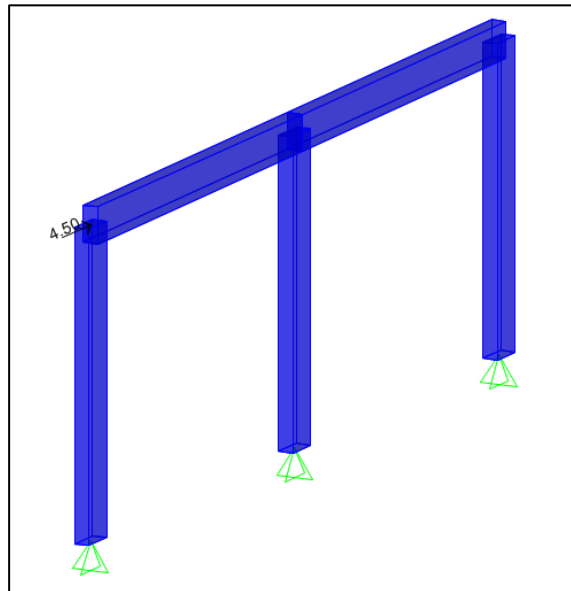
Frame resisting a lateral load parallel to the shorter direction of the house
